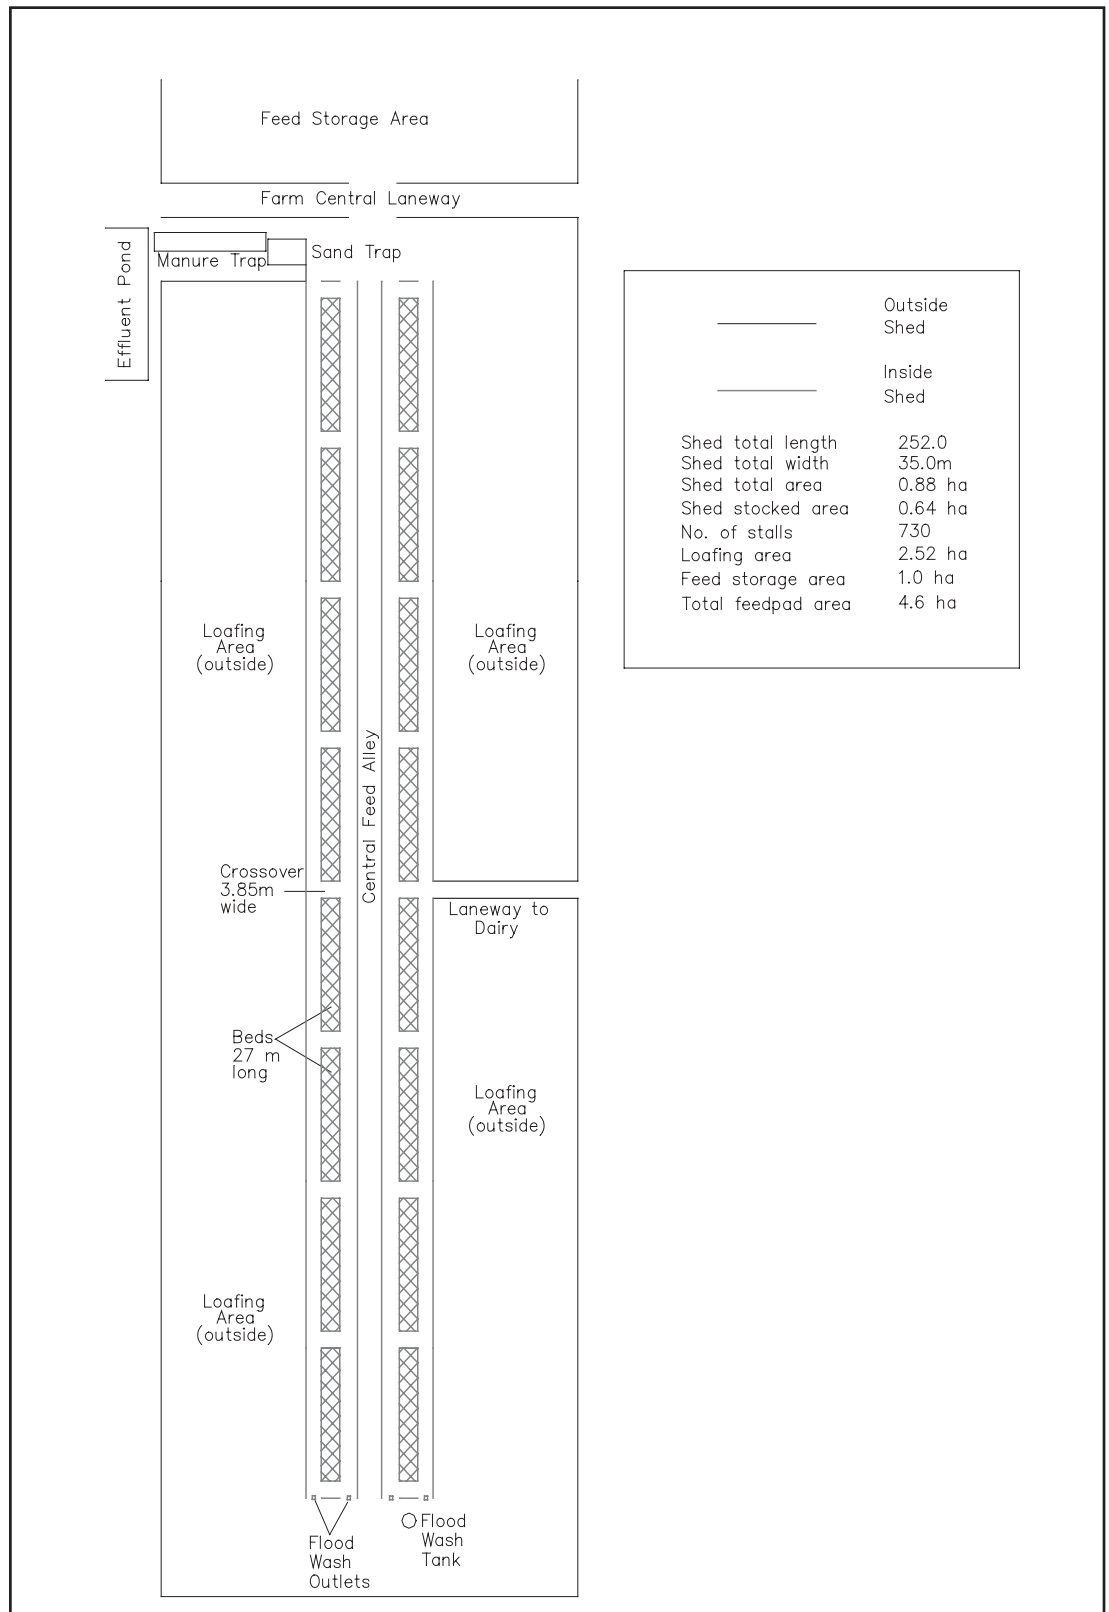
Feedpad Drawing - See Figure 20 for an example of an appropriate detailed feedpad drawing and refer to section 10.4 for details to include in the feedpad drawing.
